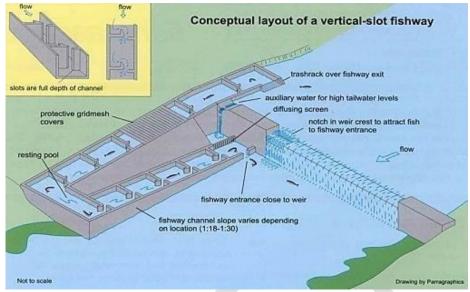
Pool Type Fish Ladder (Source: Ravichandran et. al., 2016)
